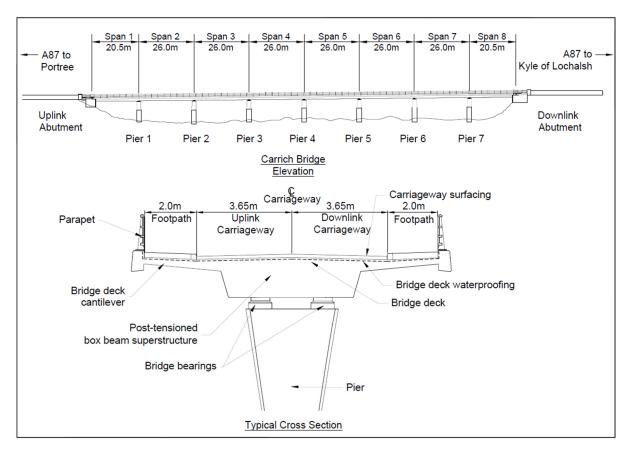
, A87 Carrich Bridge – Typical Elevation and Cross Section.
